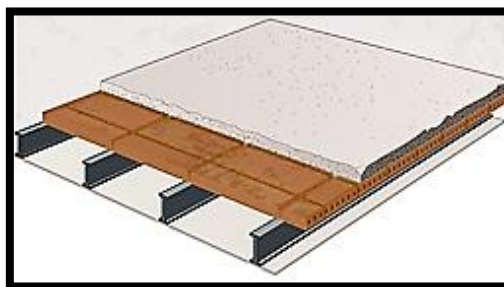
Steel-brick slab with cast concrete floor slab. (Source: Leca)
